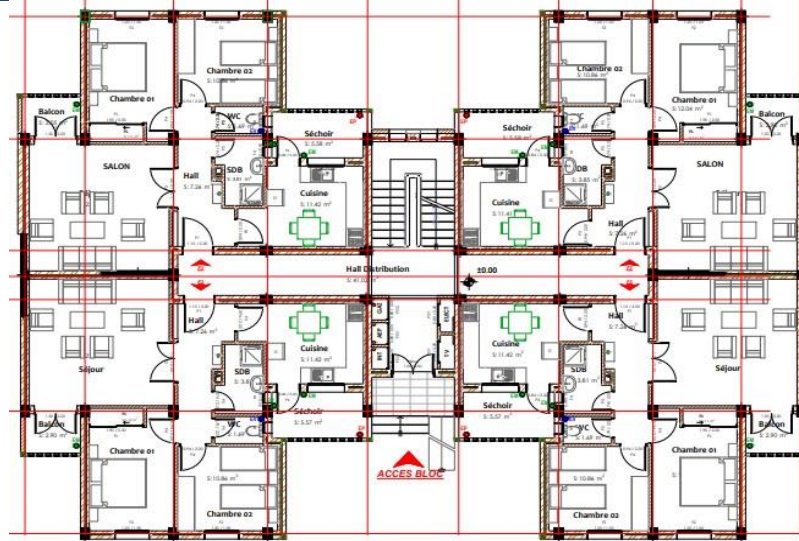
Architectural floor plan of the building, designed by office,2025)
